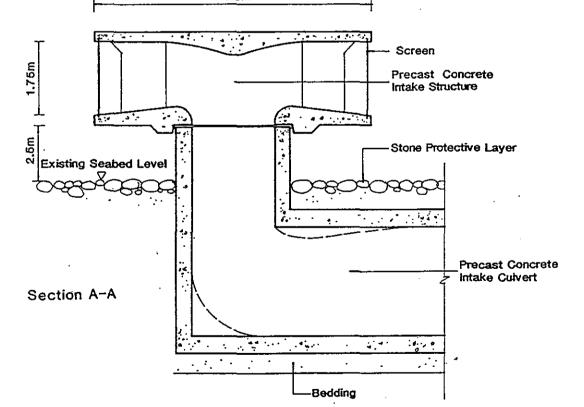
(a) Cooling Water System – Typical Precast Concrete Intake Structure 9 Chatham Road Tsimshatsui, Kowloon Hong Kong
